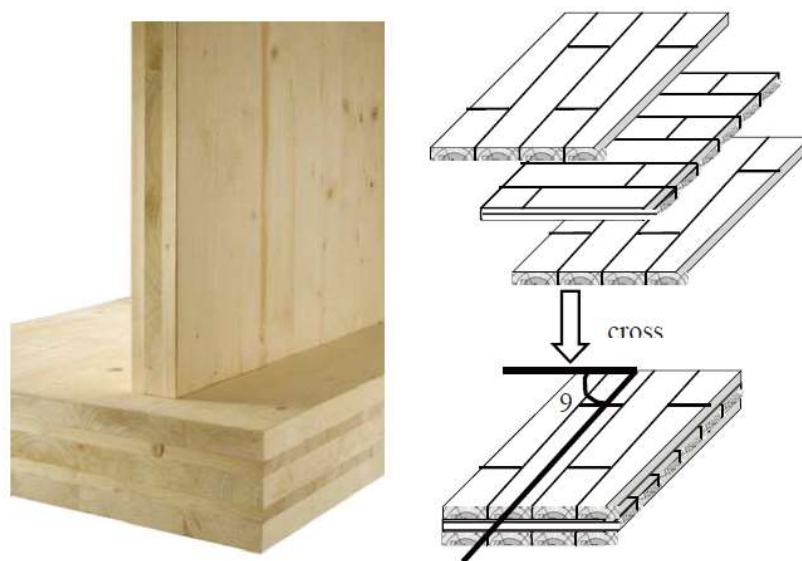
Picture of Cross laminated Timber (Van De Kuilen et al., 2011)
